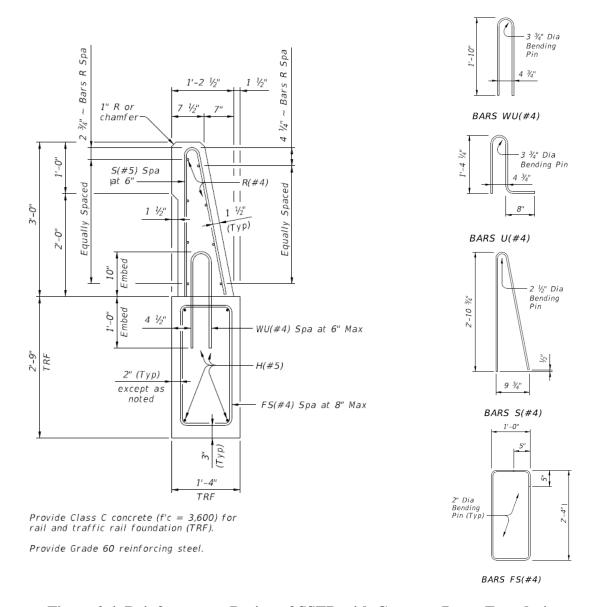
Reinforcement Design of SSTR with Concrete Beam Foundation.
